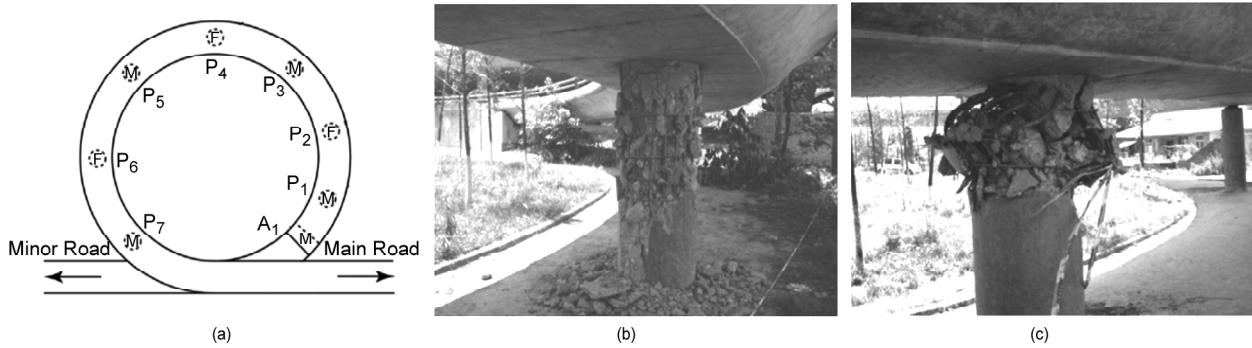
Shear and flexural failures in fixed piers of Huilan bridge: a) bridge plan (F: fixed connection, M: rubber bearing); b) damaged fixed P2; c) damaged fixed P4 (left), undamaged pinned P3 (right [4]).
